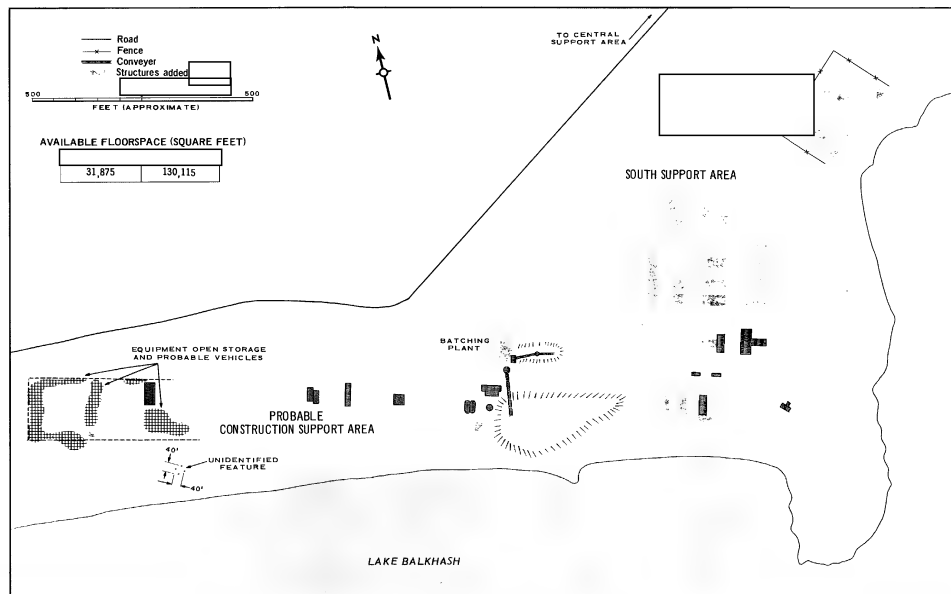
SOUTH SUPPORT AREA AT SITE 13, SSATC.
